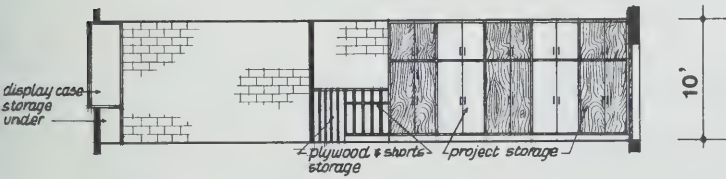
Separated Woodwork-Metalwork (grades 9-12)
